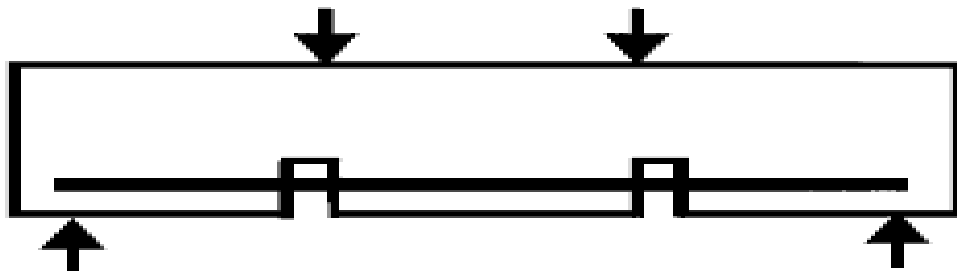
Beam anchorage specimens (ACI 408R, 2003)
